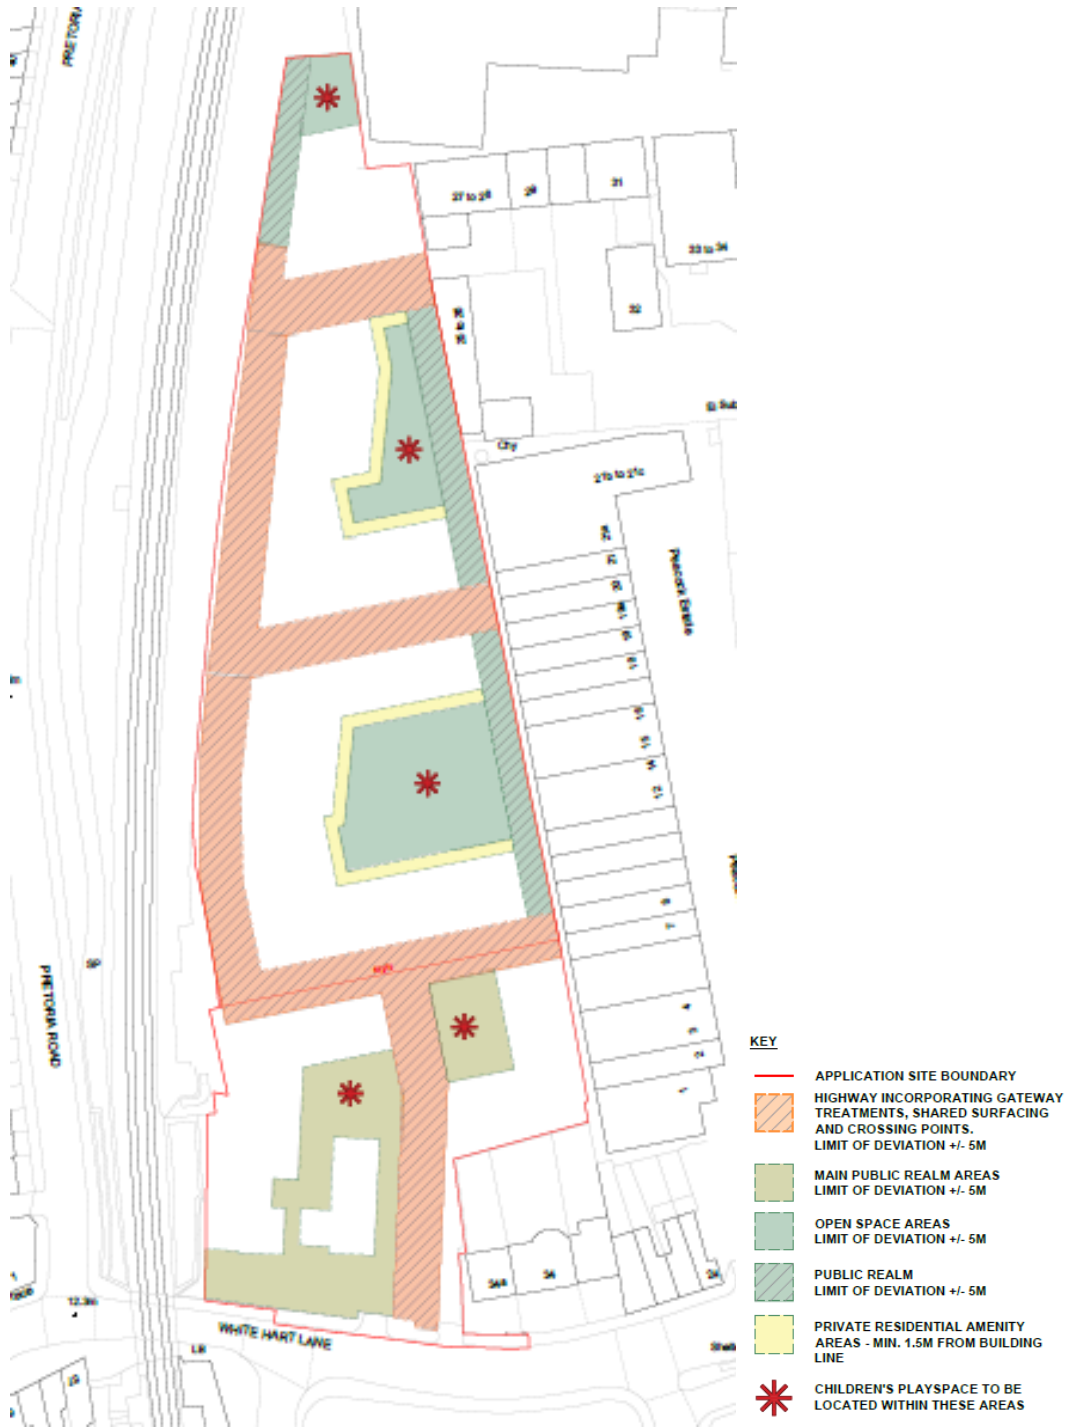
Parameter Plot Plan - Public Realm (Source: Applicant)
